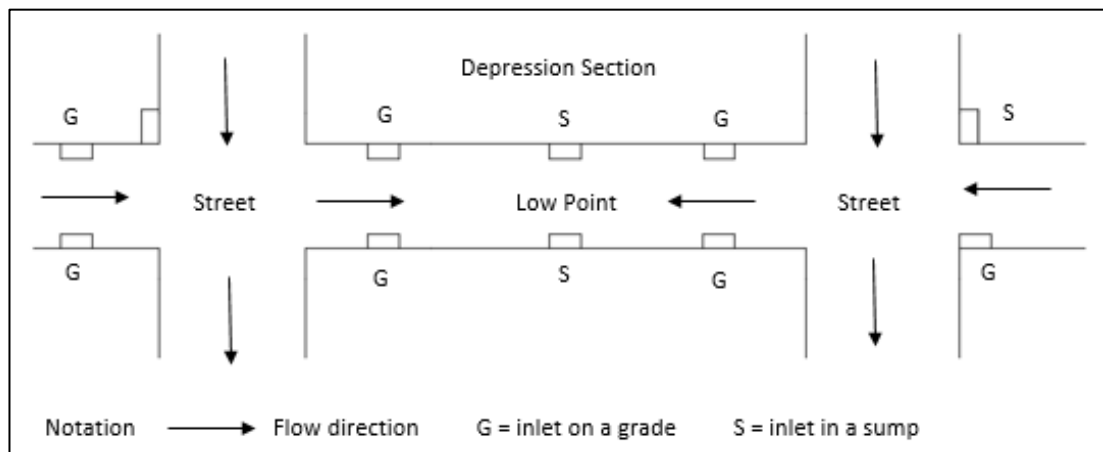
Location of Street Inlet (Adapted from Guo, 1997)
